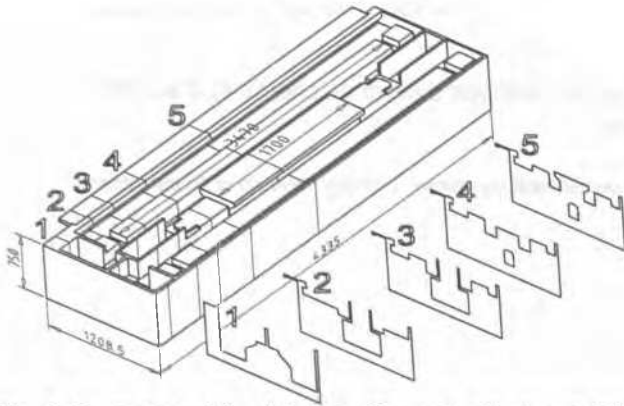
Construction of foundation (in 3D space) with characteristic cross-sections
